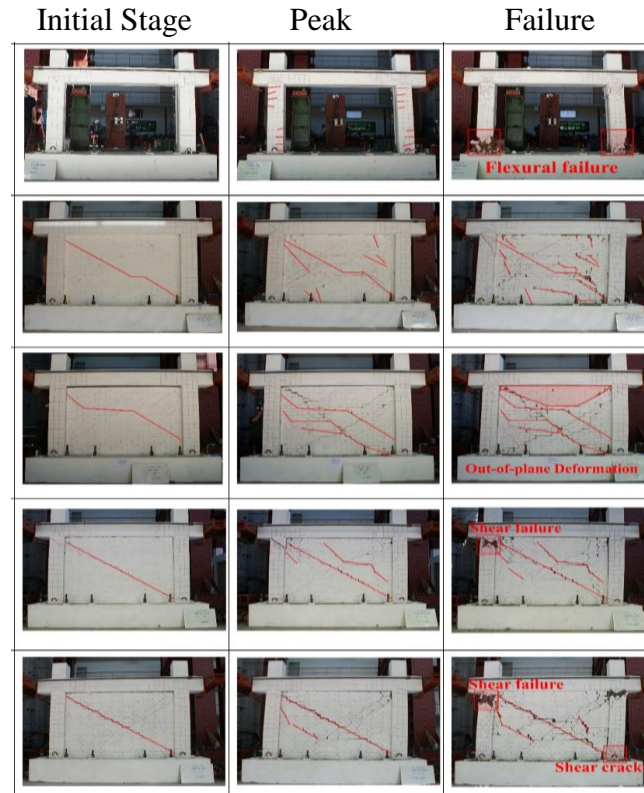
2 Cracking propagation during lateral loading of fully infilled RC frames
